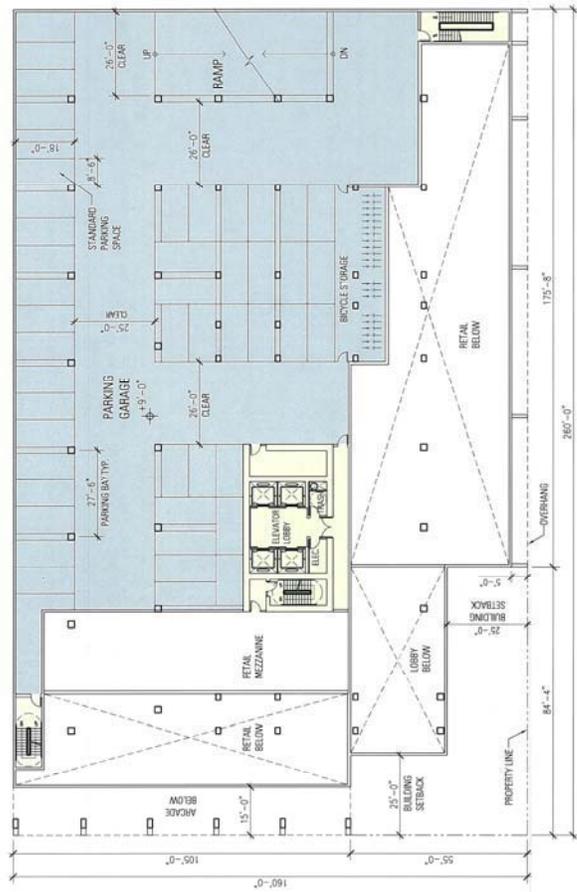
Exhibit F – Floor Plan (2nd Floor) (320 residential units)
